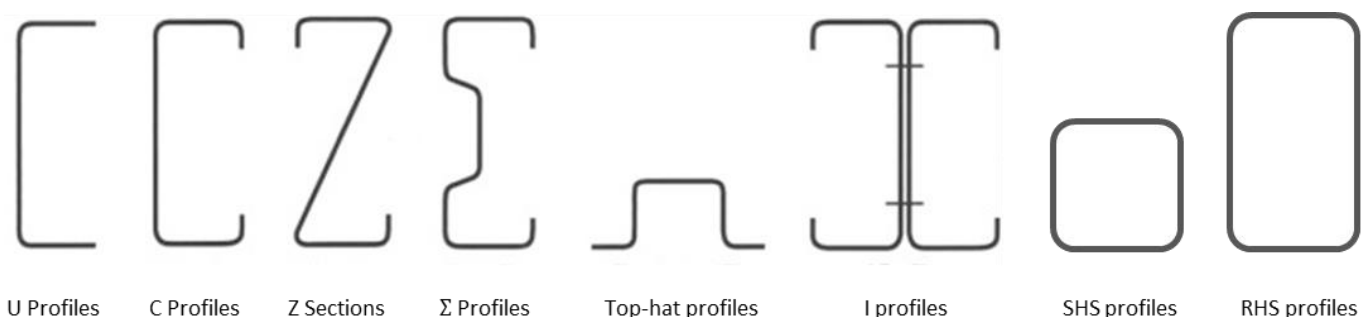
CFS section profiles used as studs in LSF walls (modified from [24])
